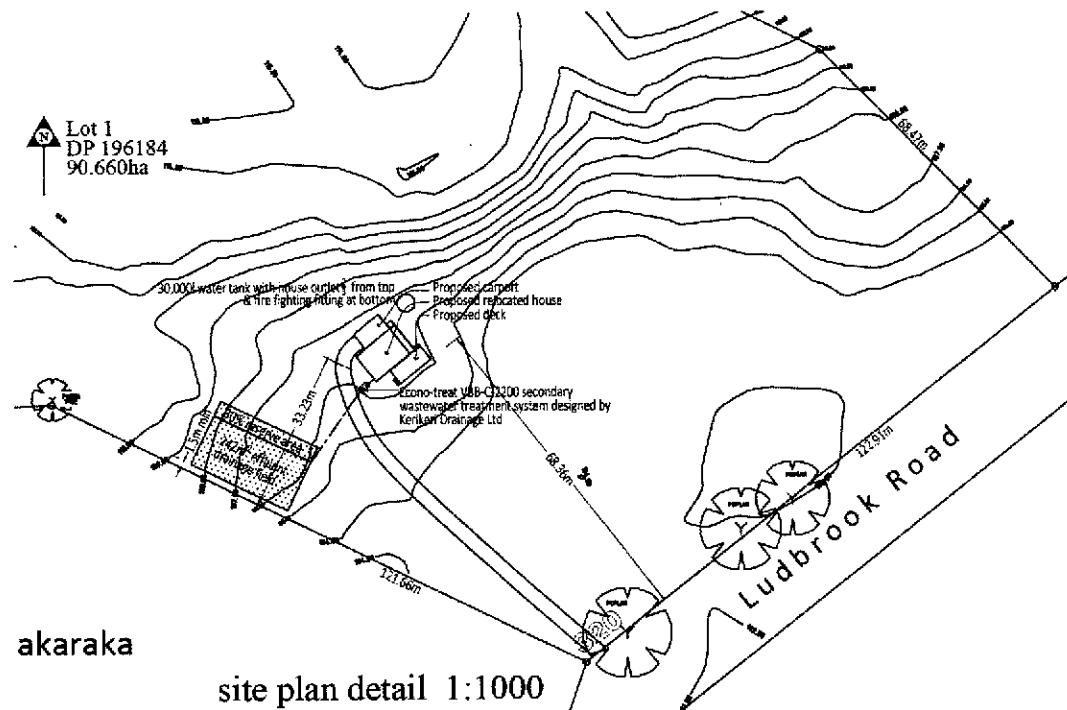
Site Plan showing the location of the proposed dwelling, carport, water tank and driveway.
